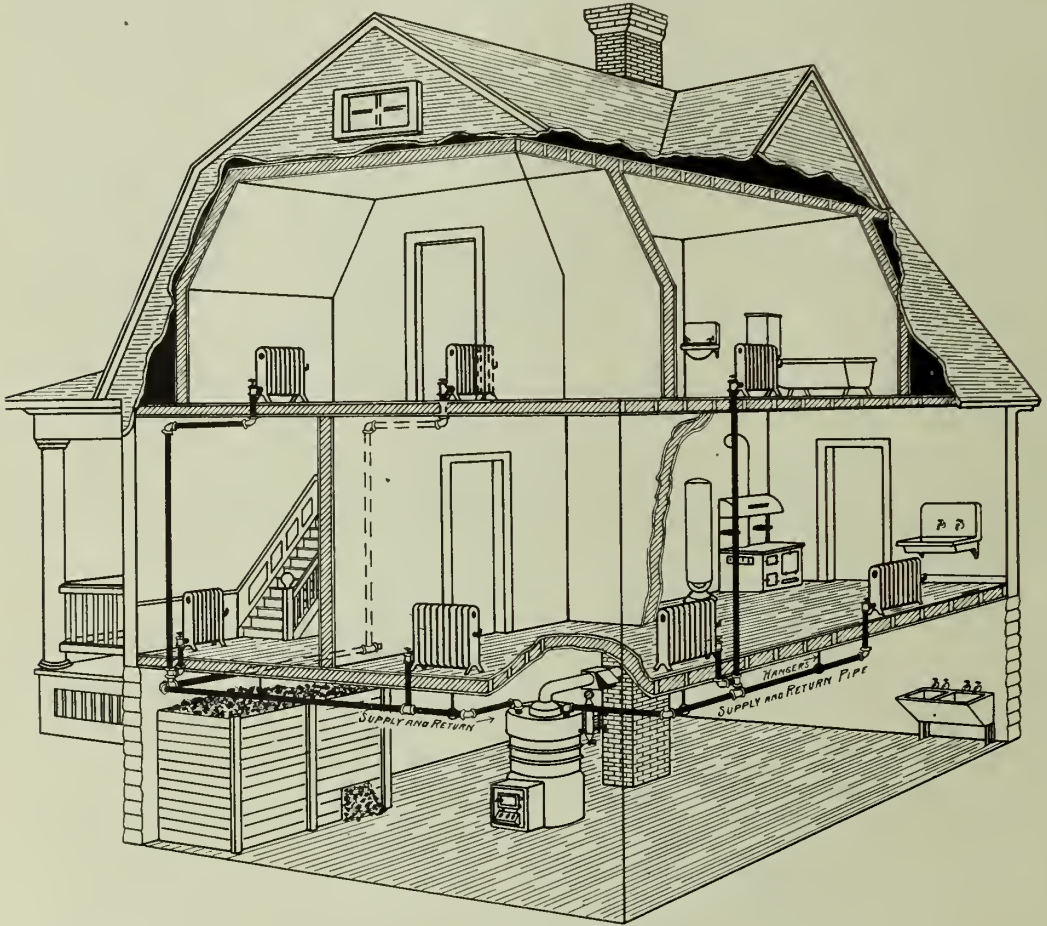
The gravity system steam heating plant installed in a dwelling.
